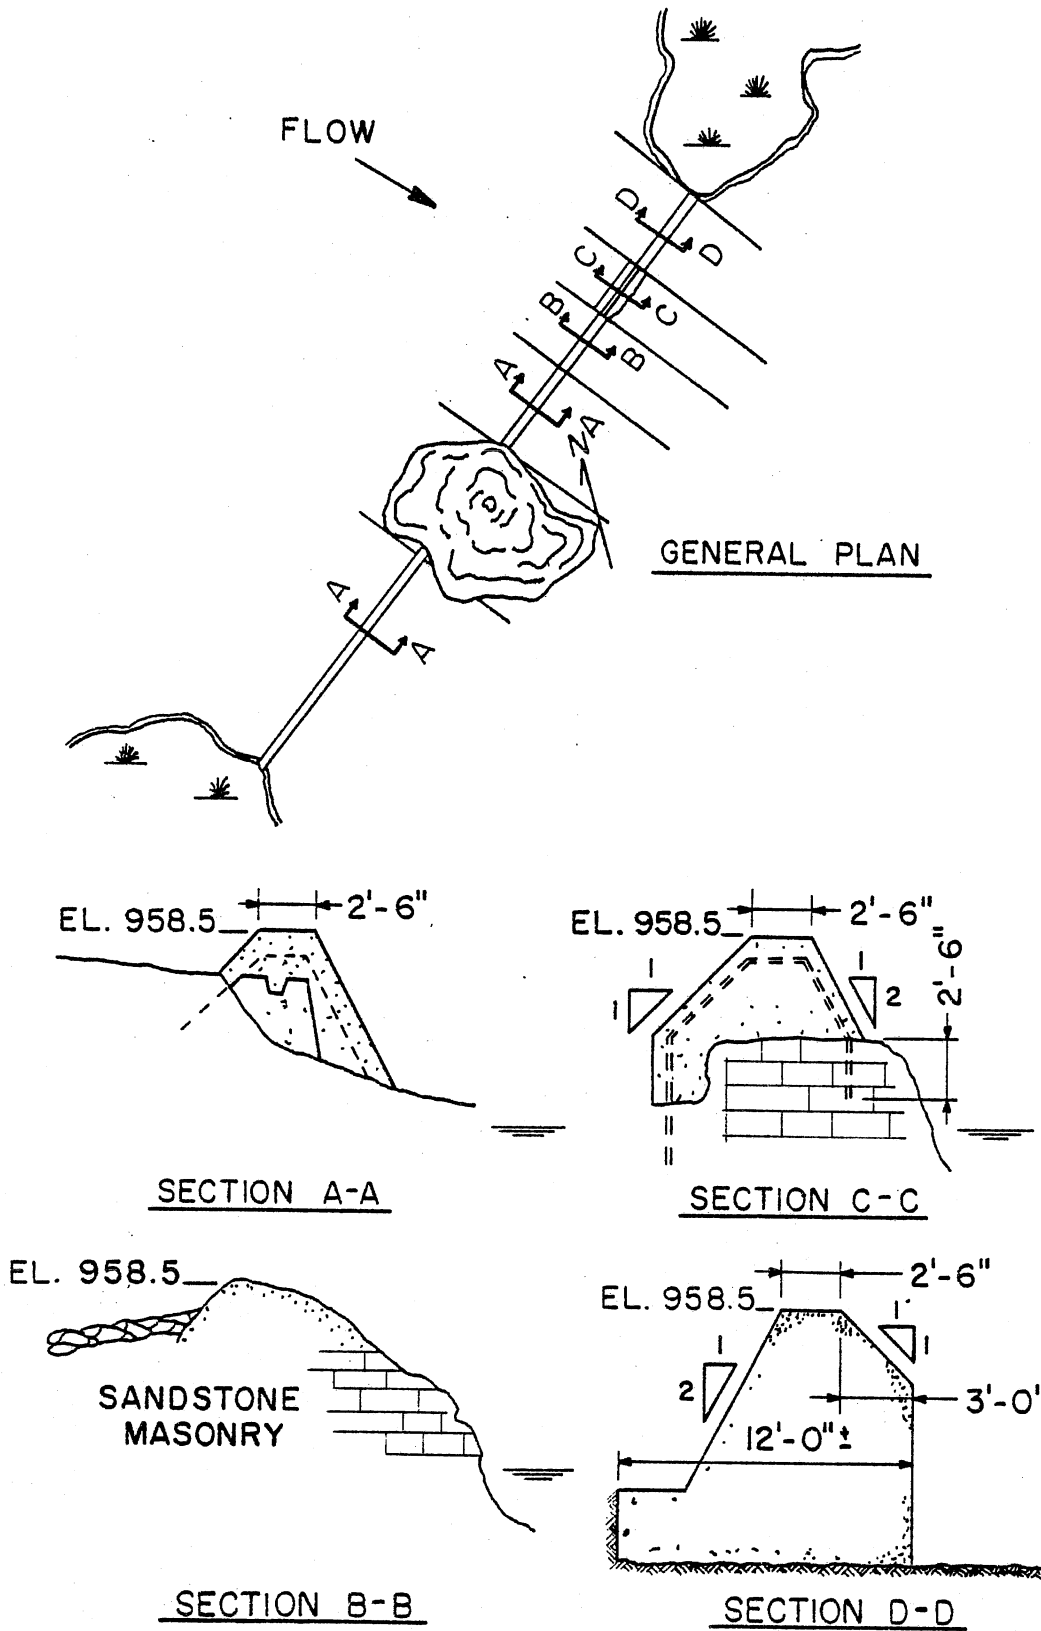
Plan and Sections of Overflow (Secondary) Spillway.
